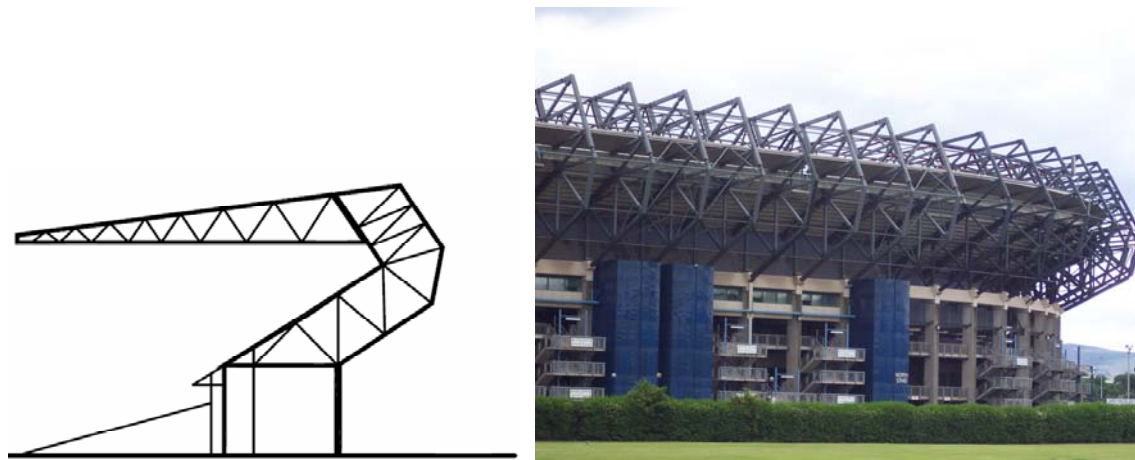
left: Structural system of the roof; right: Roof structure from outside
